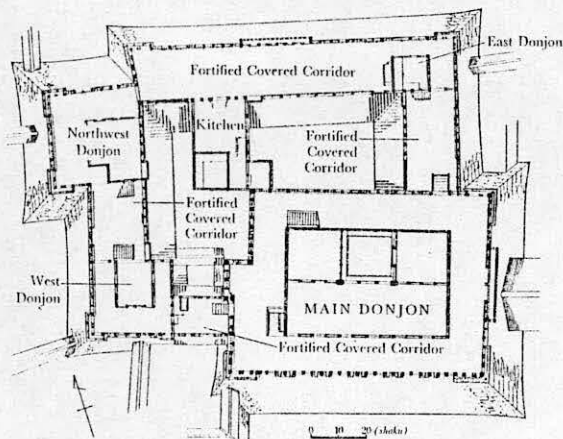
Ground plan of donjon complex of Himeji Castle completed in 1609.
